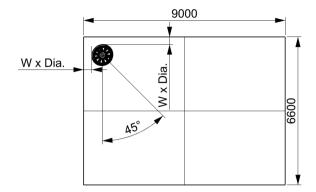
Tunnel cross-section, with a MoJet in a corner (all dimensions in mm)
